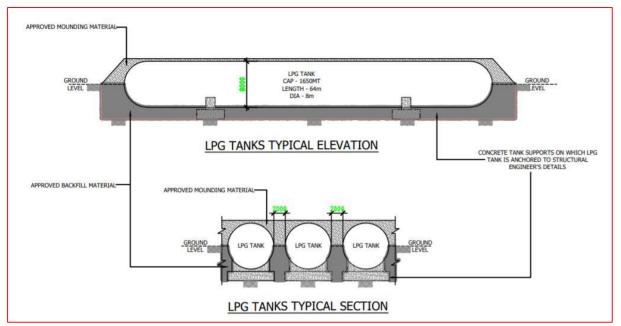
Liquefied petroleum gas tanks typical structural layout after mounding (Source: Eng. A. Muchoki, November 2020).
